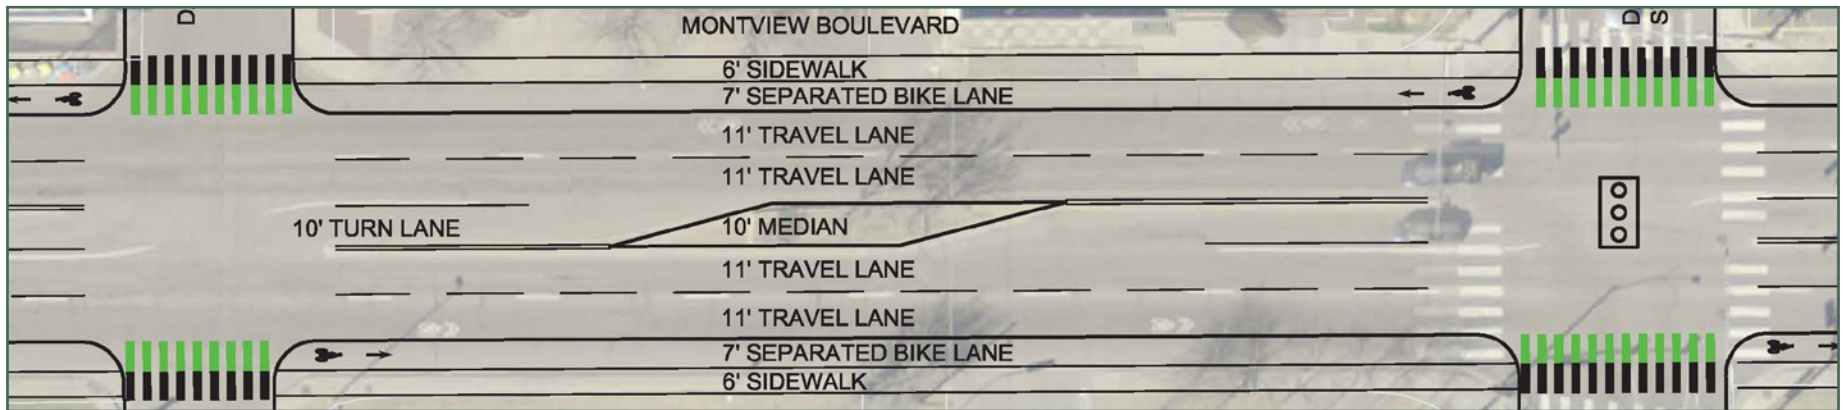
West Residential Zone Enhanced Existing with Separated Bikeway - Plan
